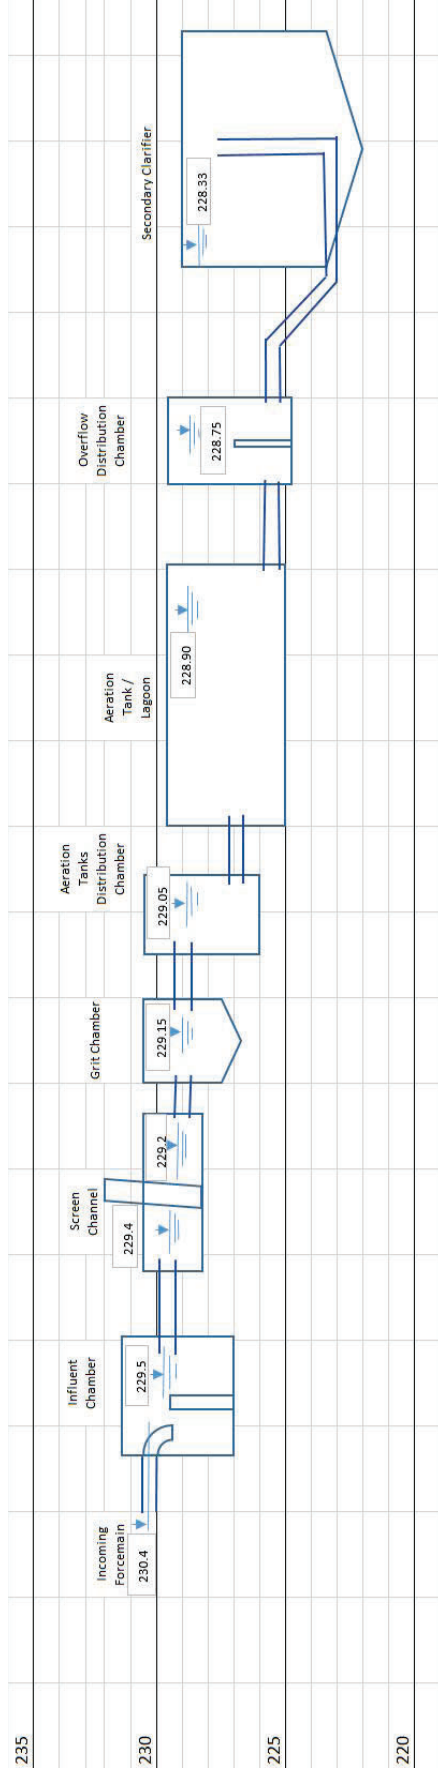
Strathroy WWTP Upgrade – Proposed Hydraulic Profile
